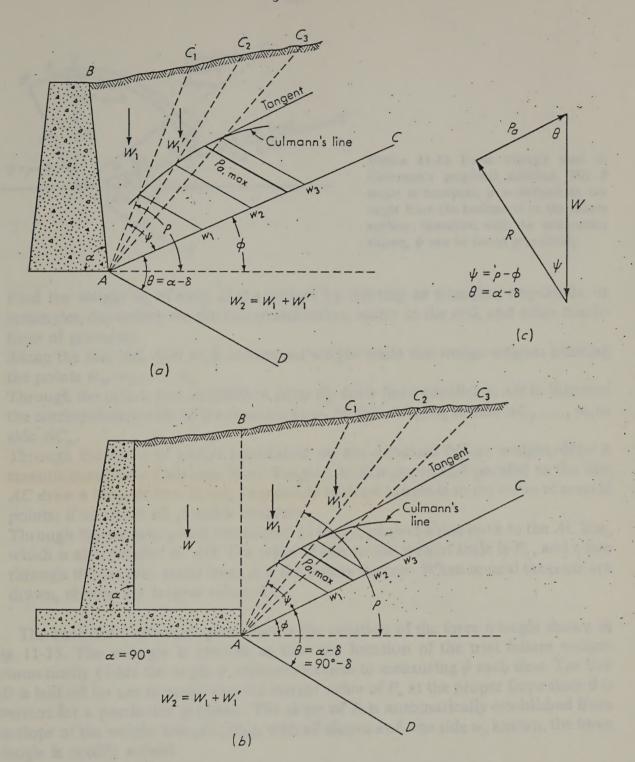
Culmann's solution for active earth pressure. (a) No interference with wall or footing; (b) cantilever retaining wall; (c) force polygon used in the Culmann graphical solution.
